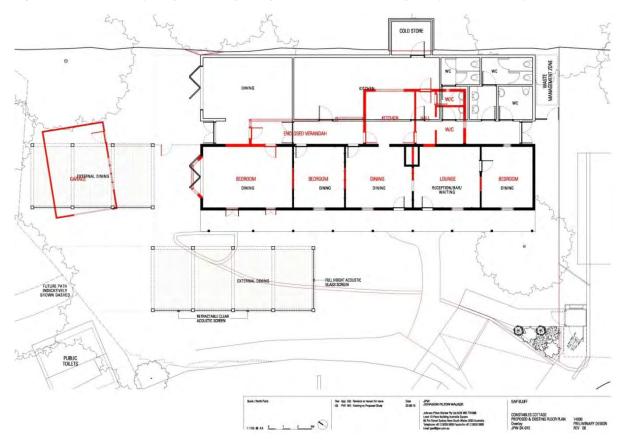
Demolition plan showing the proposal overlaid on the current site and building plan. (Source: JPW 2015)
